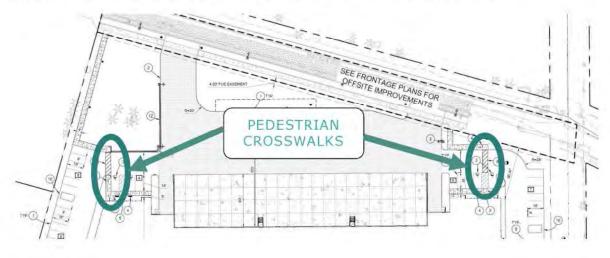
MULTIMODAL FACILITIES ON THE SITE PLAN
